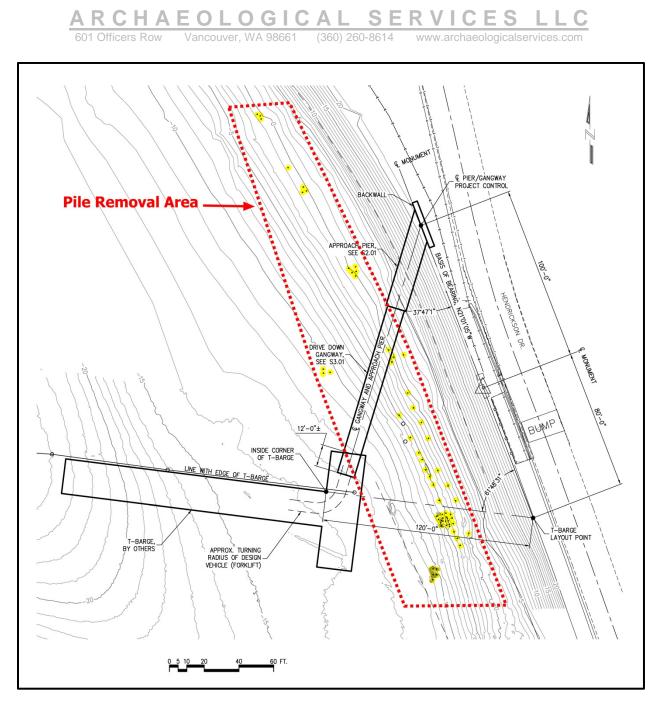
Currently available plans showing approach pier, gangway, and T-barge design. The area slated for timber pile removal is outlined in red, and known pile locations are highlighted in yellow. Additional piles are understood to be present below the water line.
